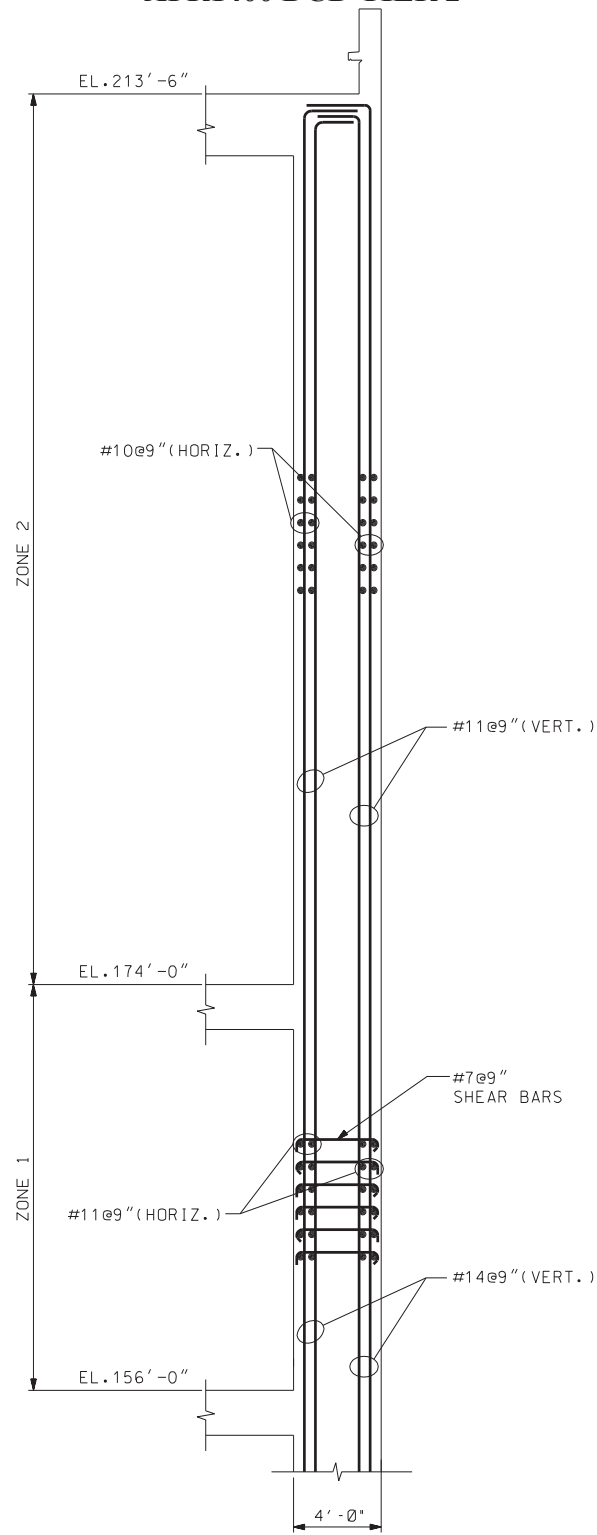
A-45 Reinforcement Arrangement of the AB SFP Wall
